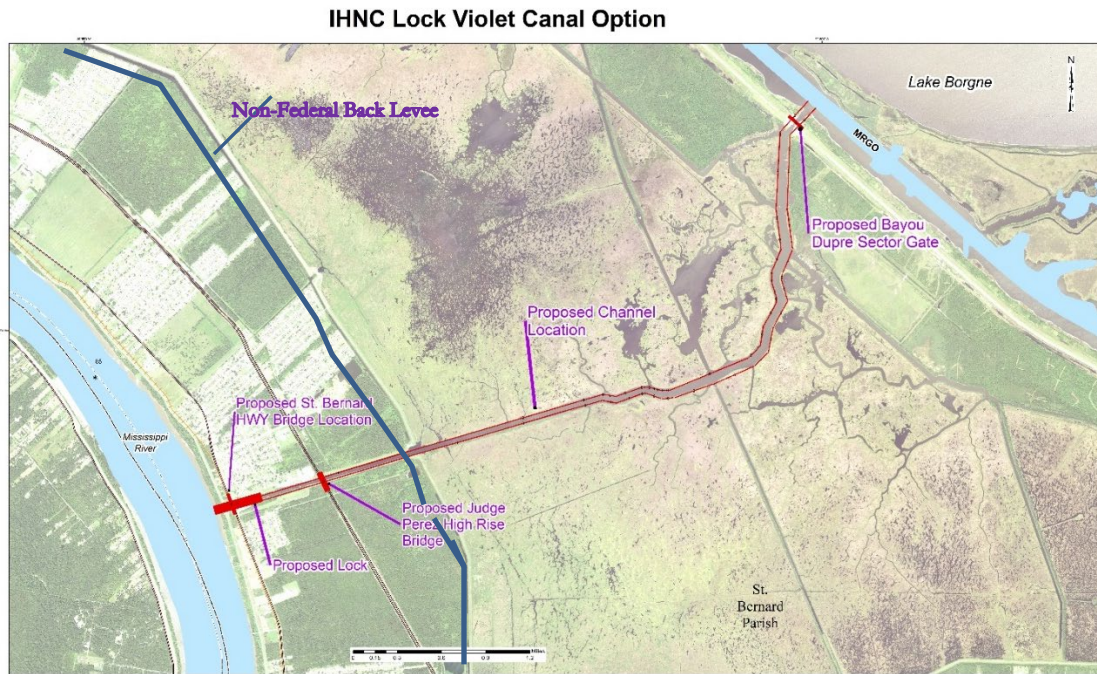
2019 GRR/SEIS Violet Site Plan – Violet Canal alternative alignment
